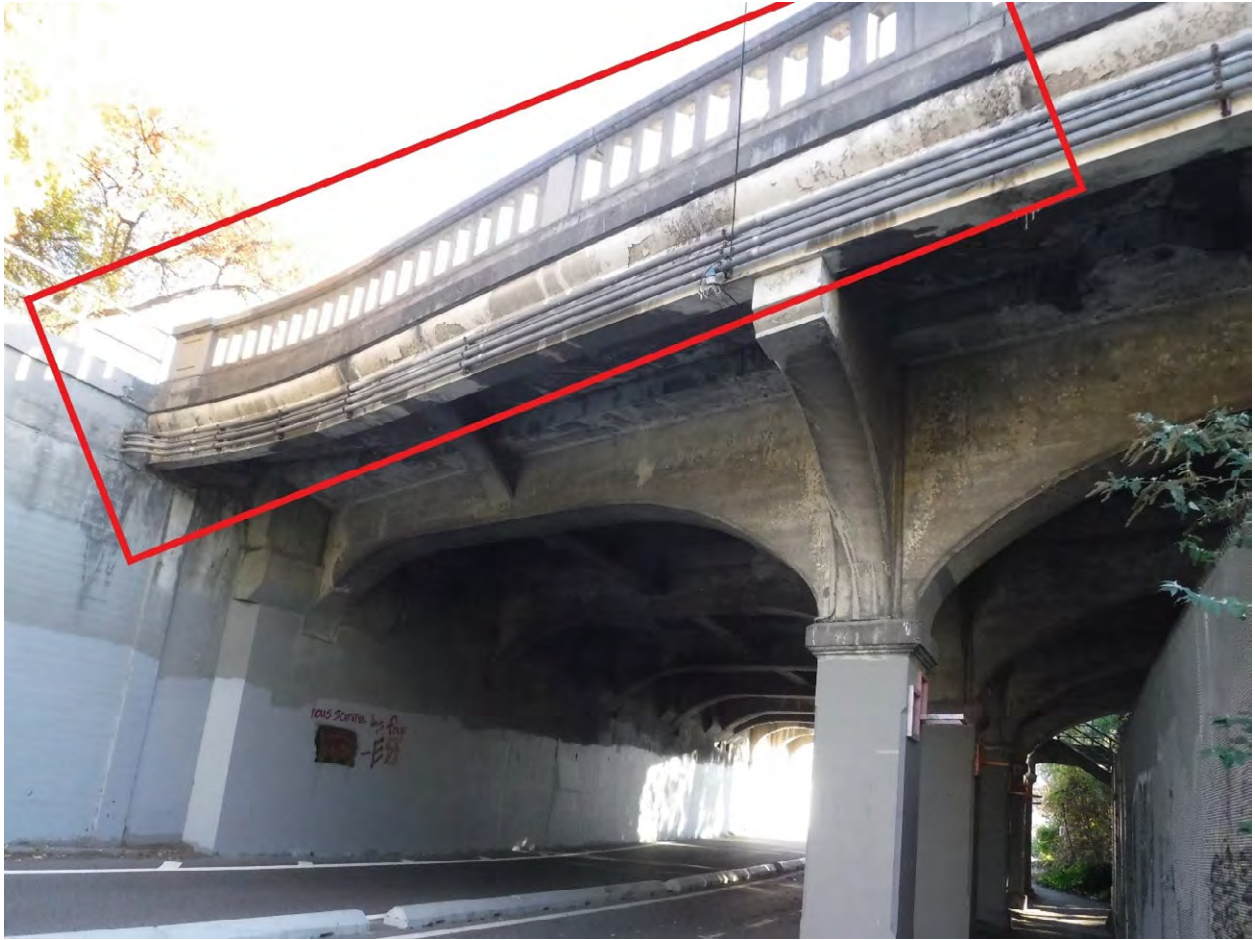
North approach, underside of west side of approach, looking northeast from NE 40th street. Balustrade highlighted (photo by HDR 2023).
